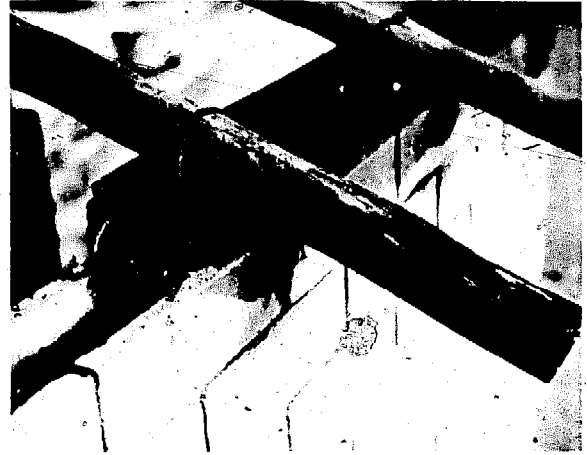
(a) Method of securing the roof truss to a soil-cement wall.
